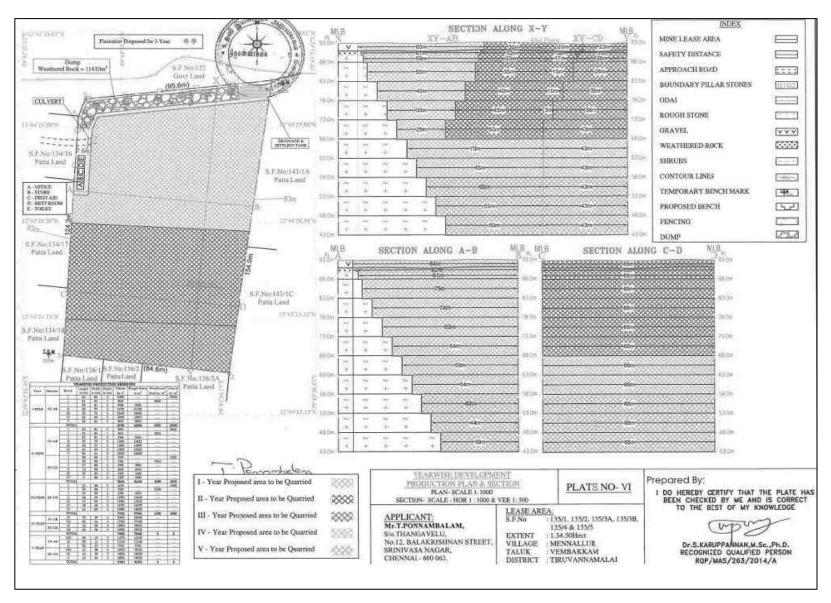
YEARWISE DEVELOPMENT PRODUCTION PLAN & SECTION
